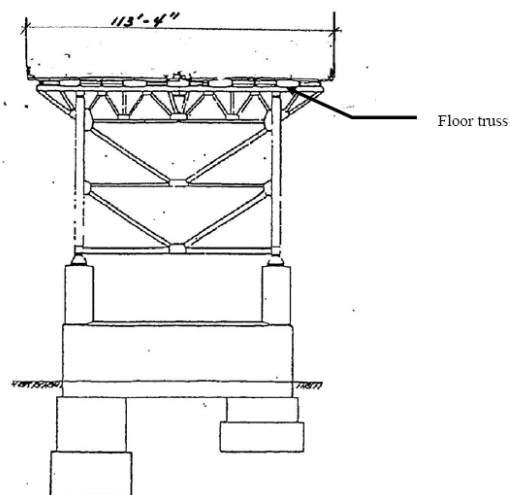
Typical cross section through the deck truss at pier 7 (NTSB, 2008b)
